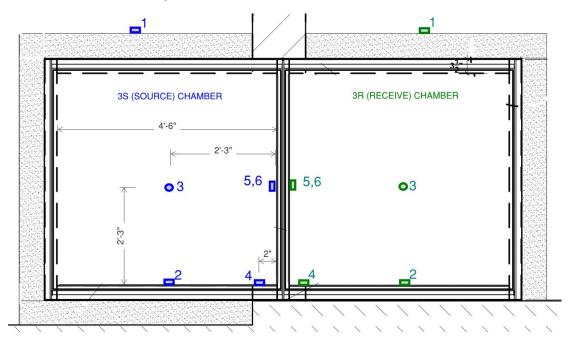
Elevation A: View of Accelerometer locations on chambers 3S and 3R for EV2
